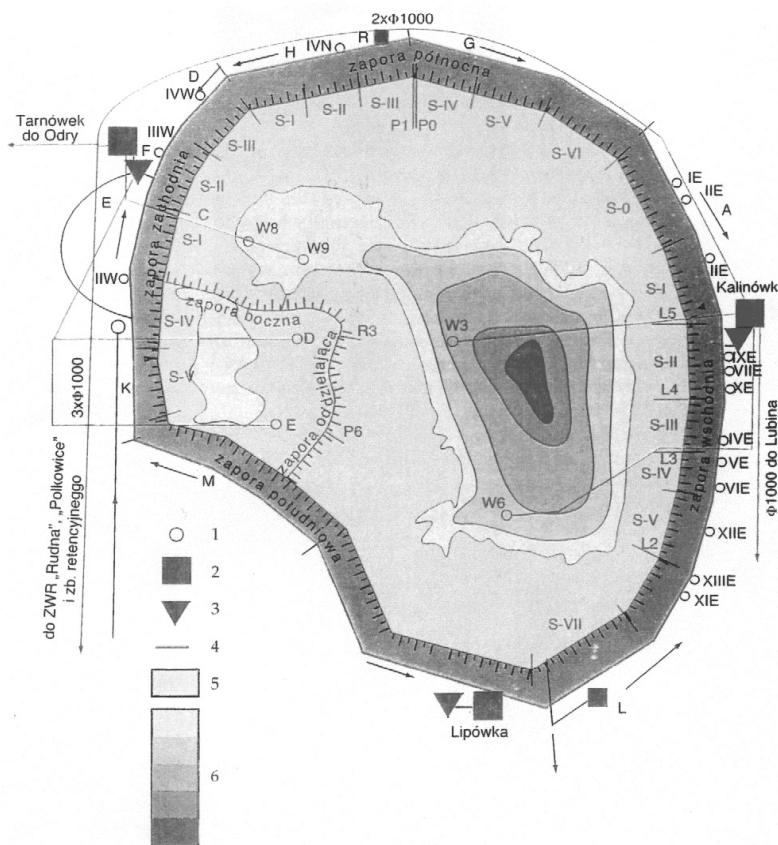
"Żelazny Most" tailings pond. Description: 1 – wells, 2 – pump house, 3 – infiltration water tank, 4 – ditch running along the dam, 5 – beach, 6 – water area
